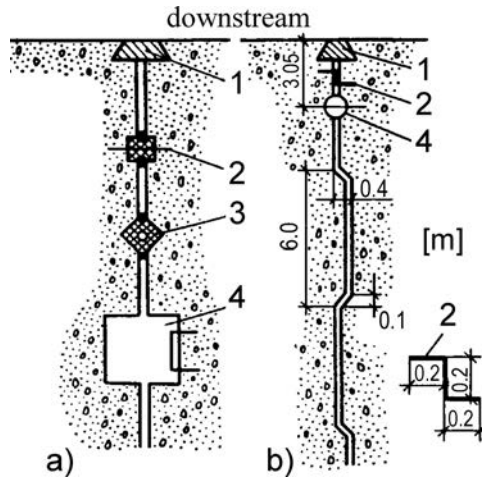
Horizontal section through joint of a dam on rock foundation. (a) Straight joint; (b) hinge joint. (1) Contour closing of joint; (2) basic closing; (3) additional basic closing; (4) drainage and inspection manhole.
